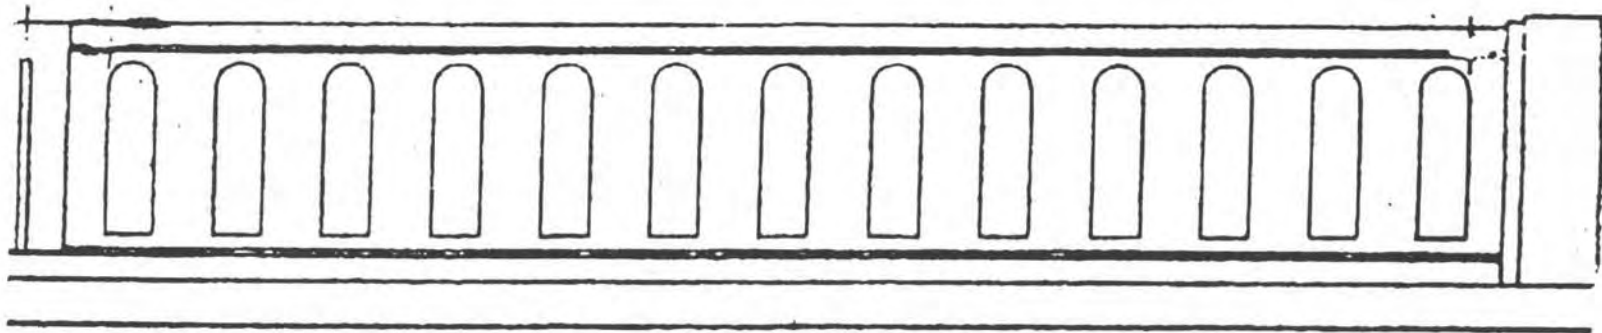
Blank crack mapping diagram of a Texas bridge rail.
